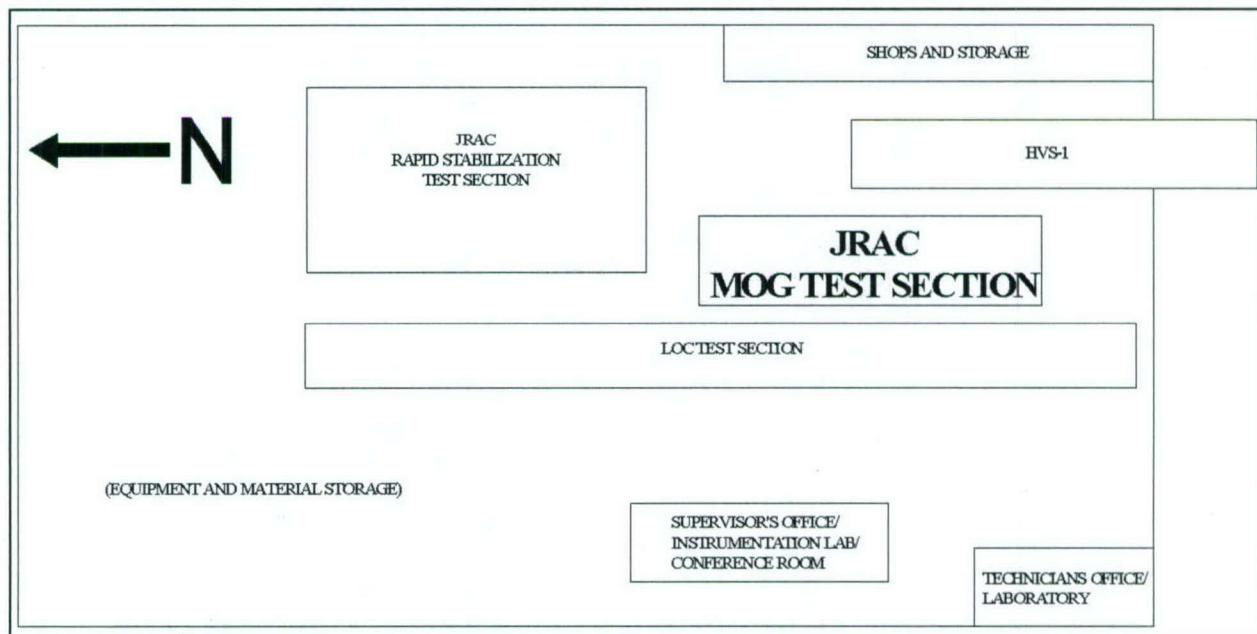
Hangar 4 Pavement Testing Facility test section layout
